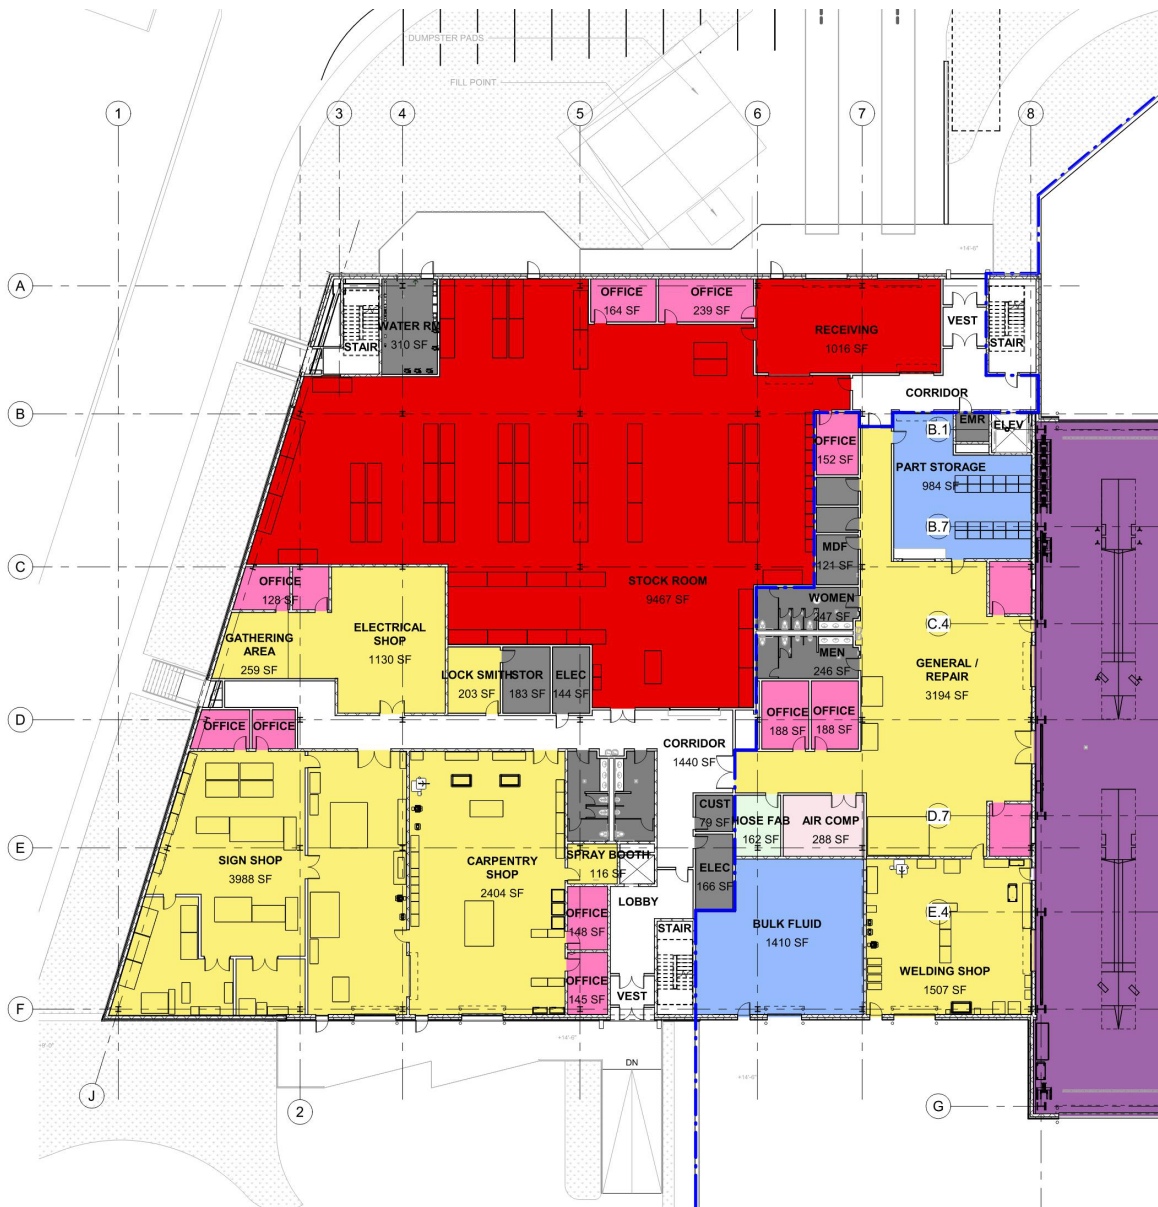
Large Vehicle Storage & Maintenance Facility second floor partial plan is provided to illustrate a more detailed view of the current layout of the various functions served inside the non-equipment spaces.
